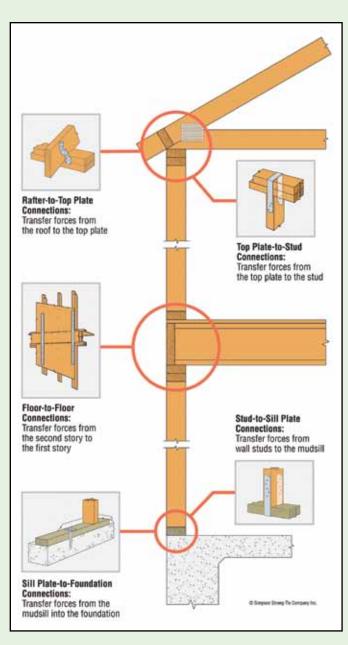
Continuous load path connection ties: (i) the roof to the wall, typically with hurricane clips and plate ties, (ii) the wall of a higher story to the wall of a lower story, with straps, and (iii) the wall to the foundation with plate ties and anchors. For a single-story house, the connections between the higher and lower stories are not needed. These connections are in all new houses. Older homes usually will not have these features. In many cases, retrofitting can easily be done for certain portions. Source: Simpson Strong-Tie.
